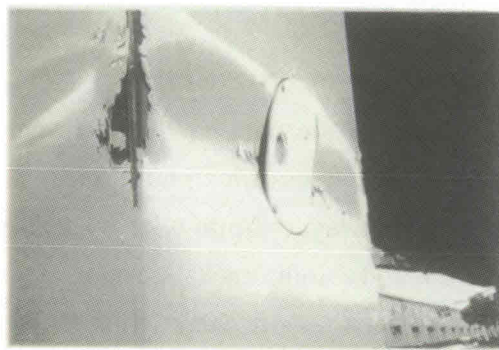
Steel pier buckled locally at a manhole flange of the harbor by-pass
